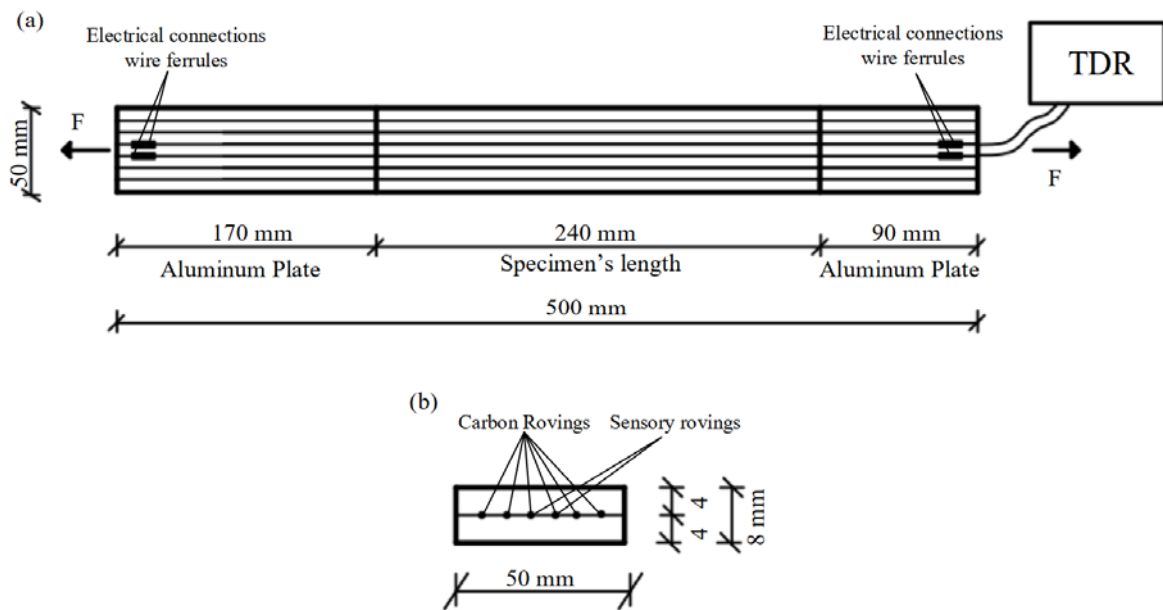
Experimental layout: (a) Uniaxial tensile loading beam; (b) Typical cross-section.
